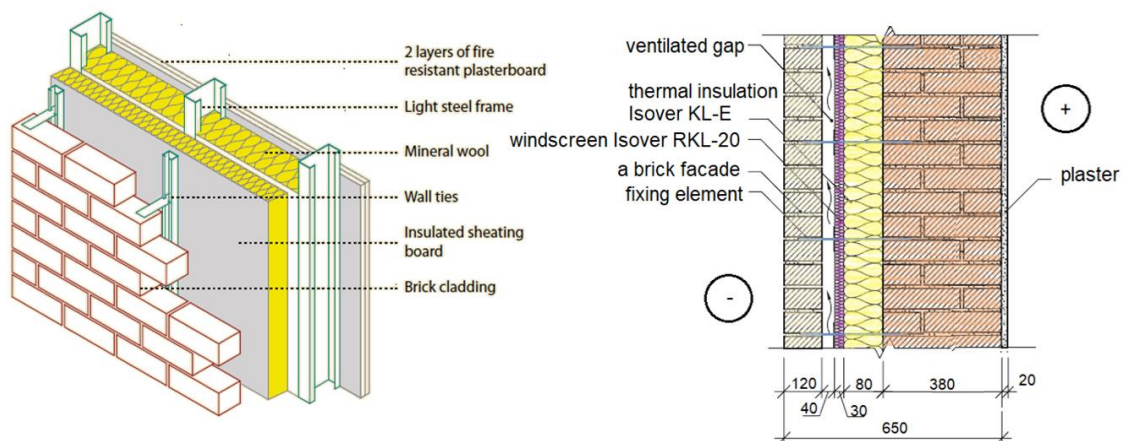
Wall envelope structures: for the steel frame (on left) (SCI 2008), for original building brick wall (on right)
